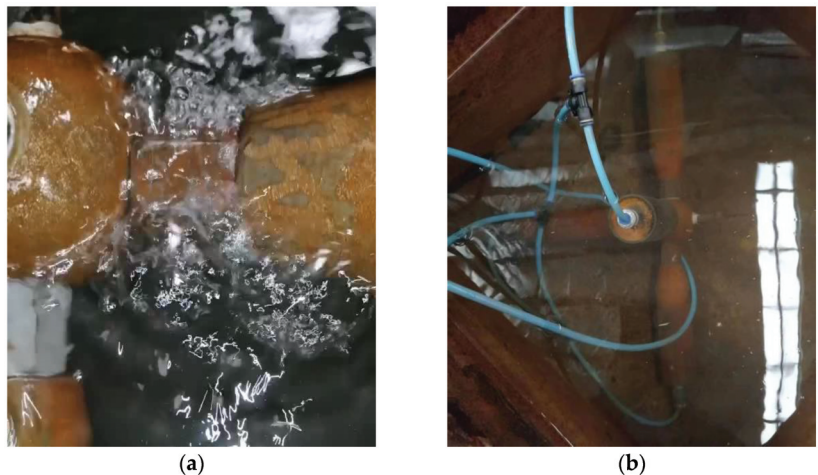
Airtightness testing experiment of the bolted ball joint: (a) No sealing setting; (b) With sealing setting.
